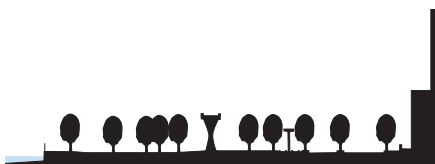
Proposed Cross Section from False Creek to the Base of City Gate Towers
